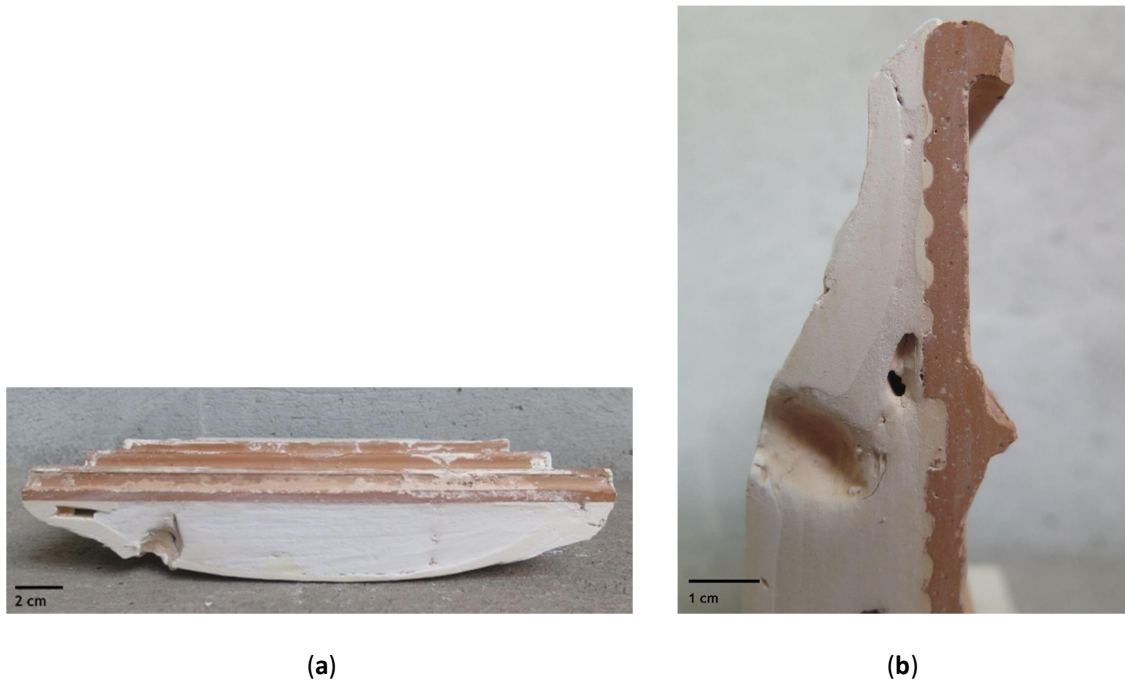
(a) Cross-section of the replica; Grout 1 has been injected into the replica positioned horizontally. © Gvantsa Potskhishvili, 2016; (b) Cross-section of the replica; Grout 1 has been injected into the replica positioned vertically. © Gvantsa Potskhishvili, 2016.
